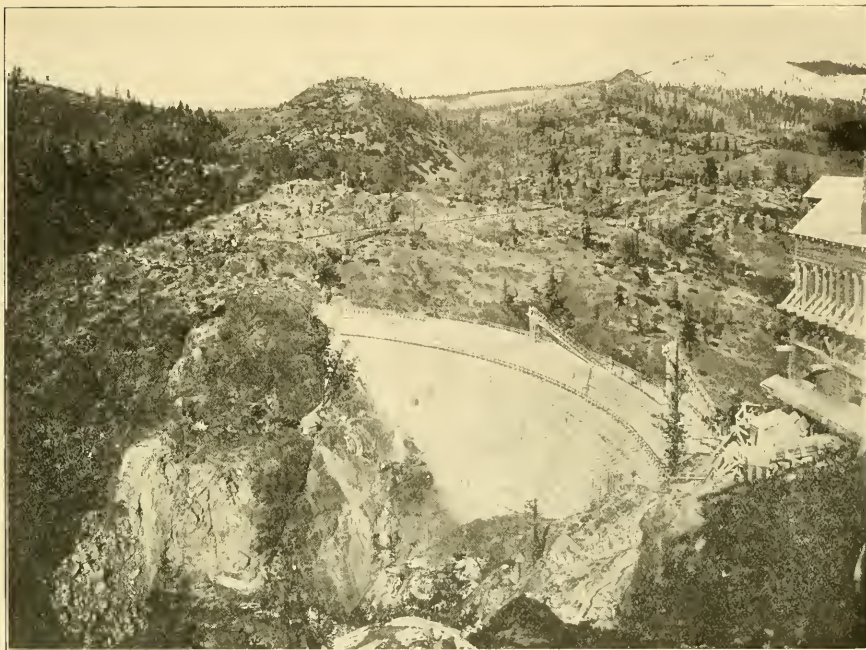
DOWNSTREAM FACE OF SPAULDING DAM, SHOWING STEPS AND BOND RAILS PROVIDED FOR RAISING DAM TO 300 FT.
